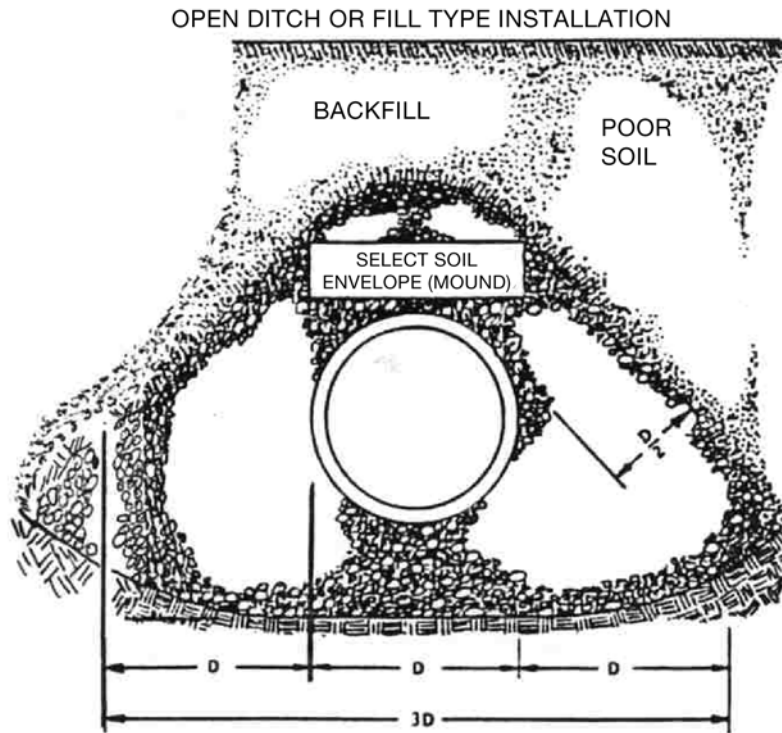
Minimum Embedment Width When Native Soil Can Not Sustain a Vertical Cut or When Installed in the Embankment Condition
